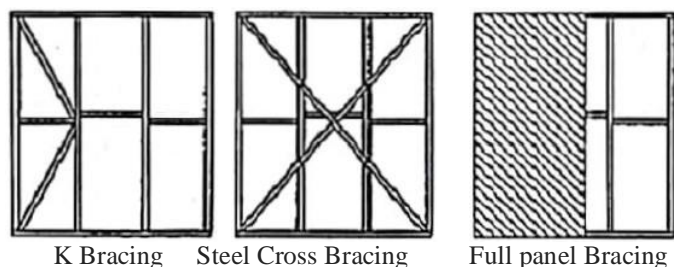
Bracing Types Used in Light Framed residential structures, Serrette (1997)
